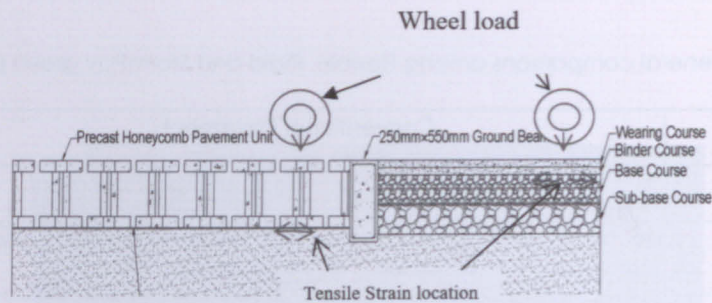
Location of tensile strain in StormPav and conventional flexible pavement
